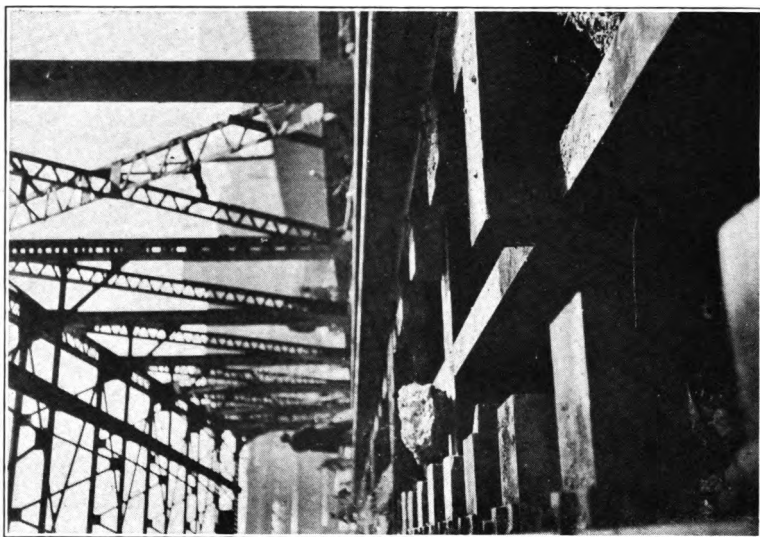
Ashland Avenue Bridge—Long ties placed on stringers at intervals to support track.
